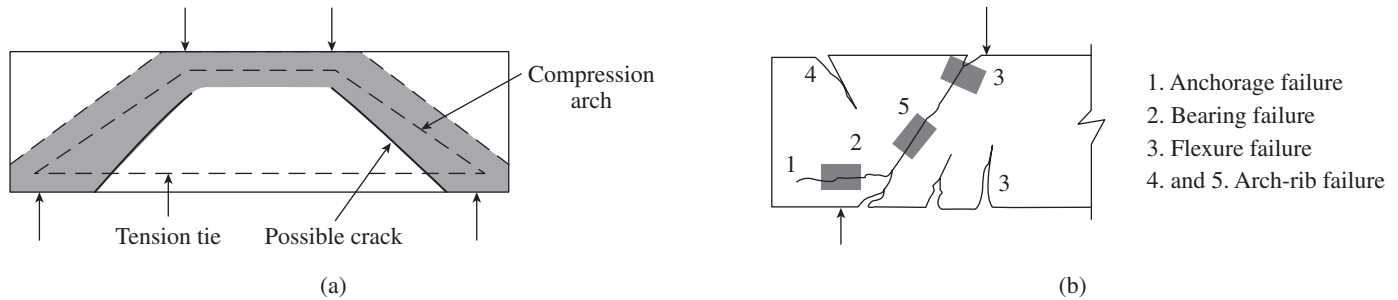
Modes of failure of deep beams (a) Arch action (b) Types of failures
